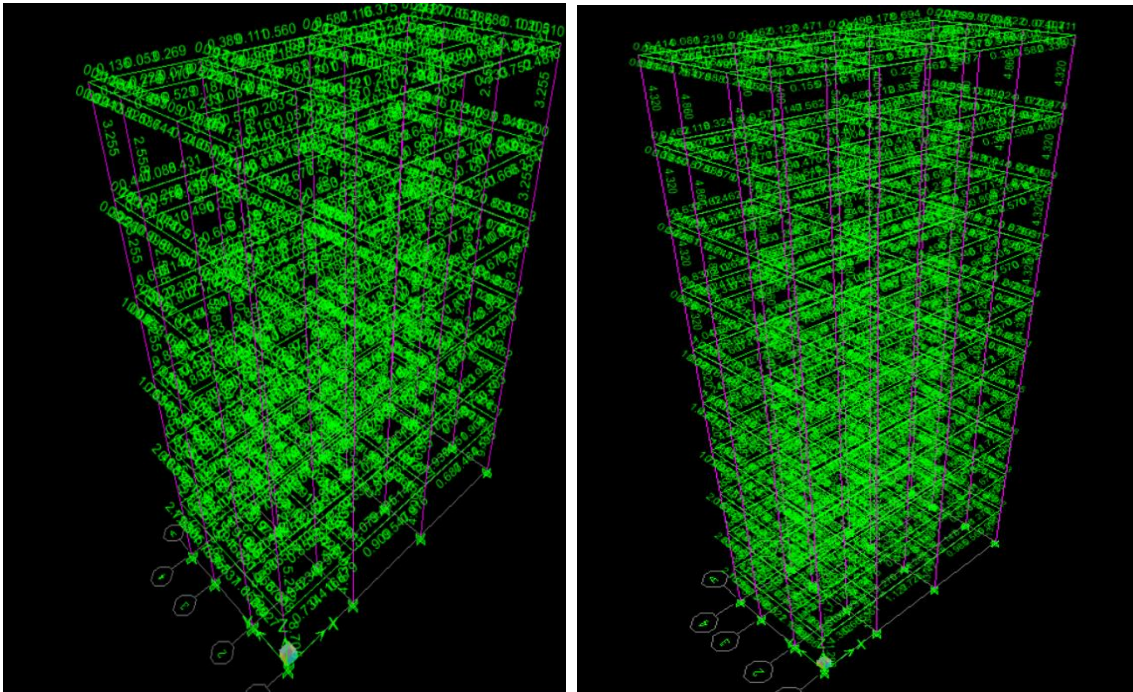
Corner View with Steel Area Six(left) & Ten(right) Storied
